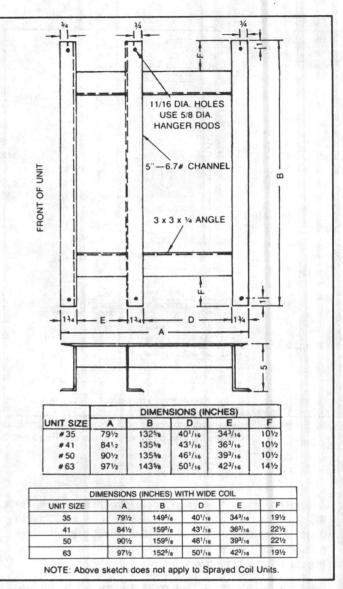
Ceiling Suspension Mounting Frame and Dimensions for Unit Sizes 35 to 63
